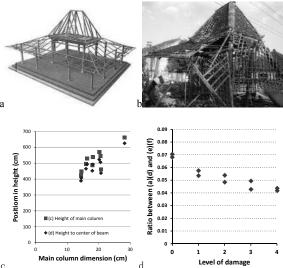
a. Joglo wooden structure; b Joglo damage by earthquake; c. Position in height against main column dimension; d. Ratio between column width/column height and short span/long span of core structure against level of damage.
